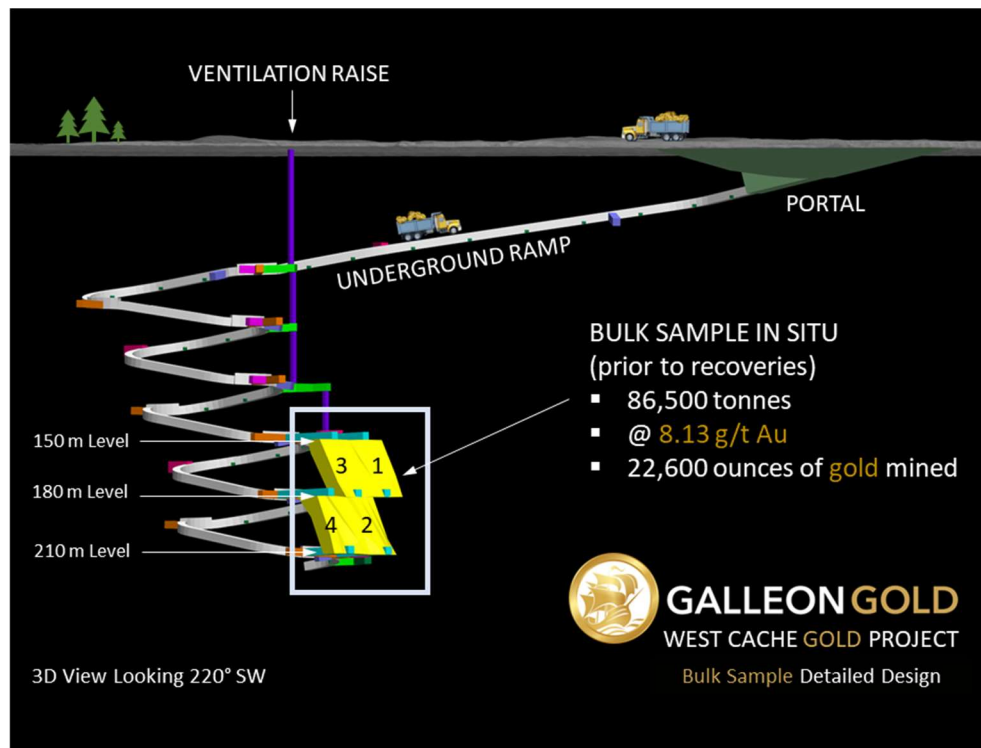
Planned Portal and Underground Workings for Bulk Sample
